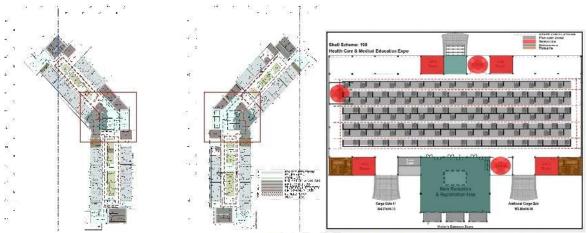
Typical Floor plan of PKLI on left, Expo Center on right
